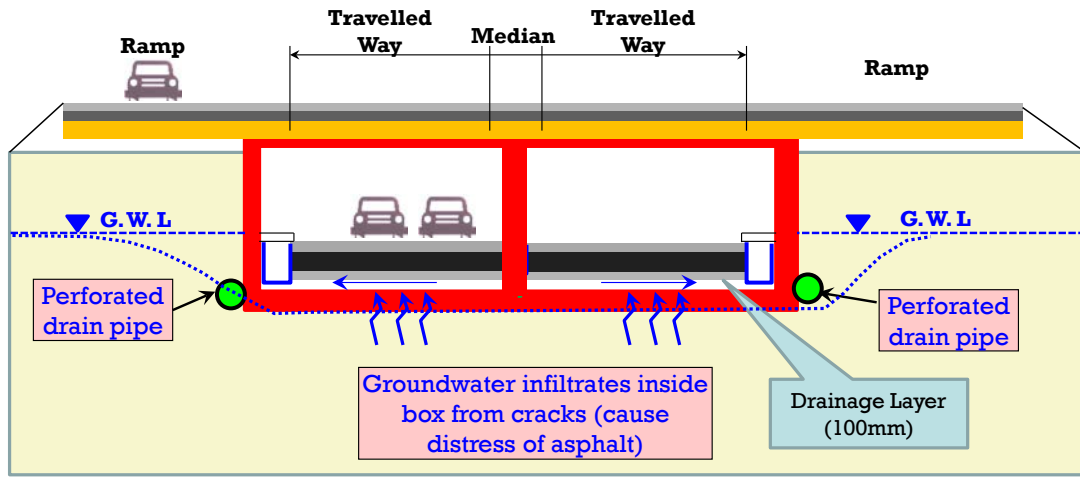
Underground Drainage Pipe Layout in BOX Culvert Section
